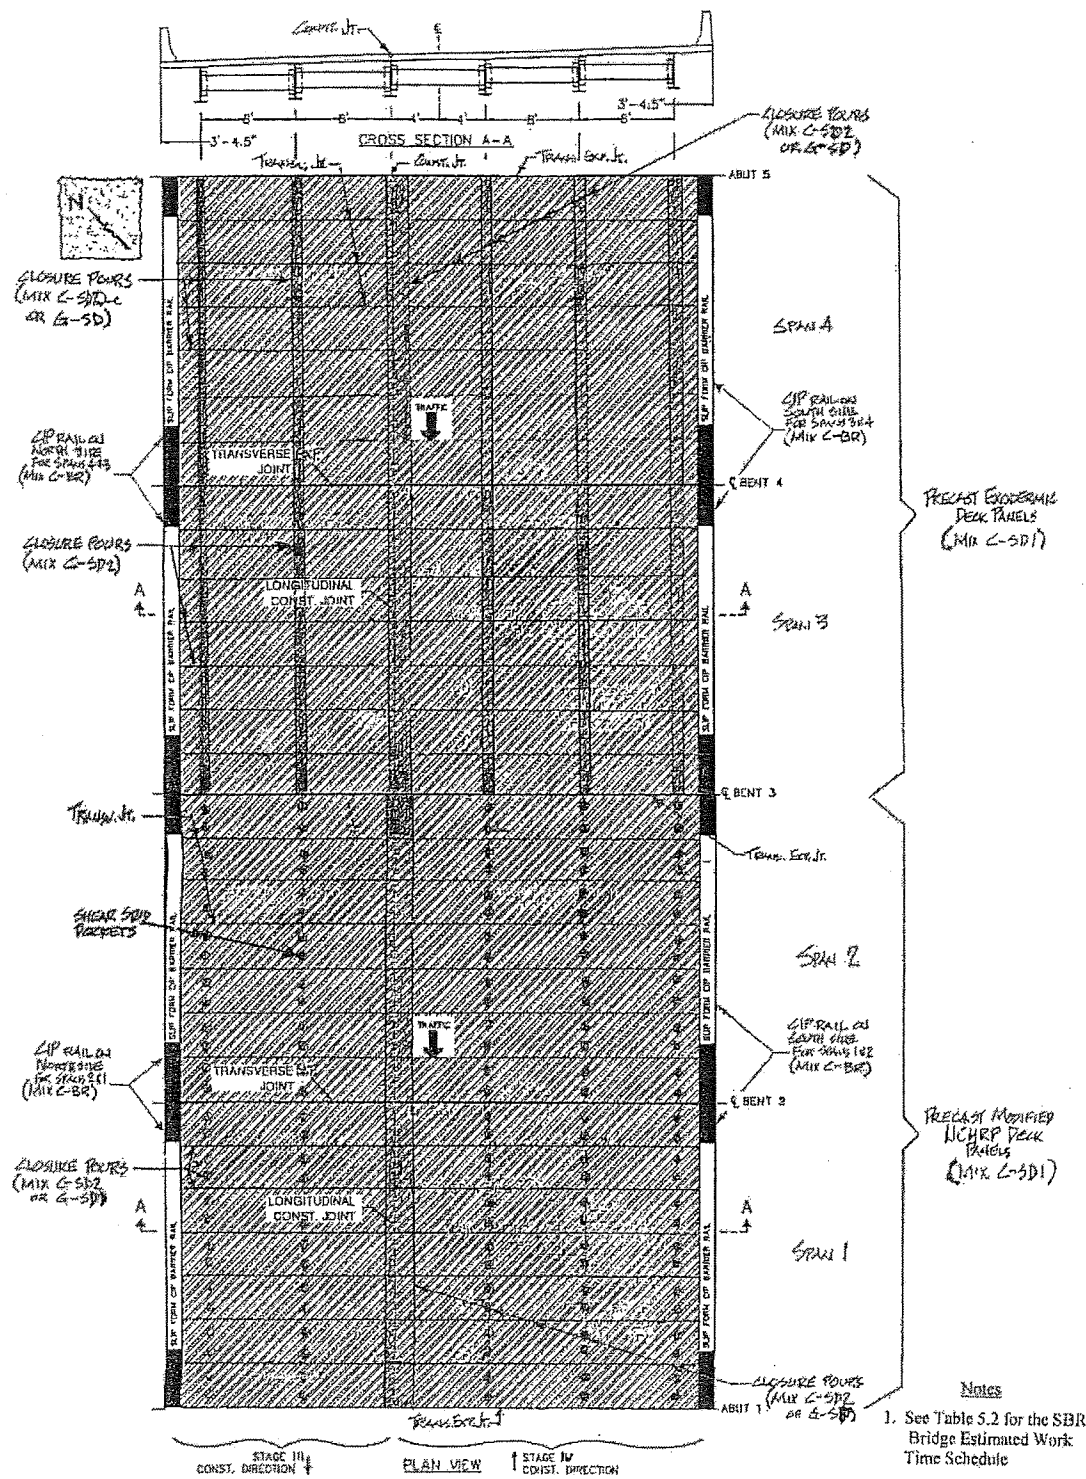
SBR Bridge Precast Panel Deck Replacement
